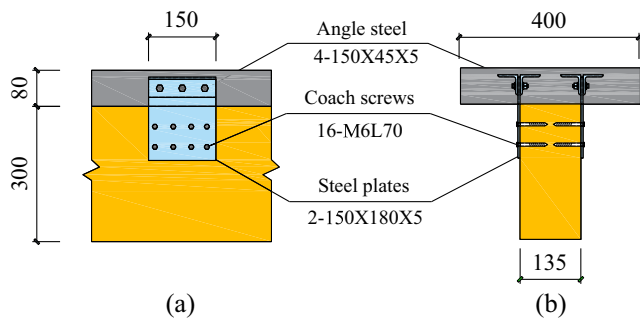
Details of the shear connection: (a) front view, (b) cross-section diagram (Unit: mm).
